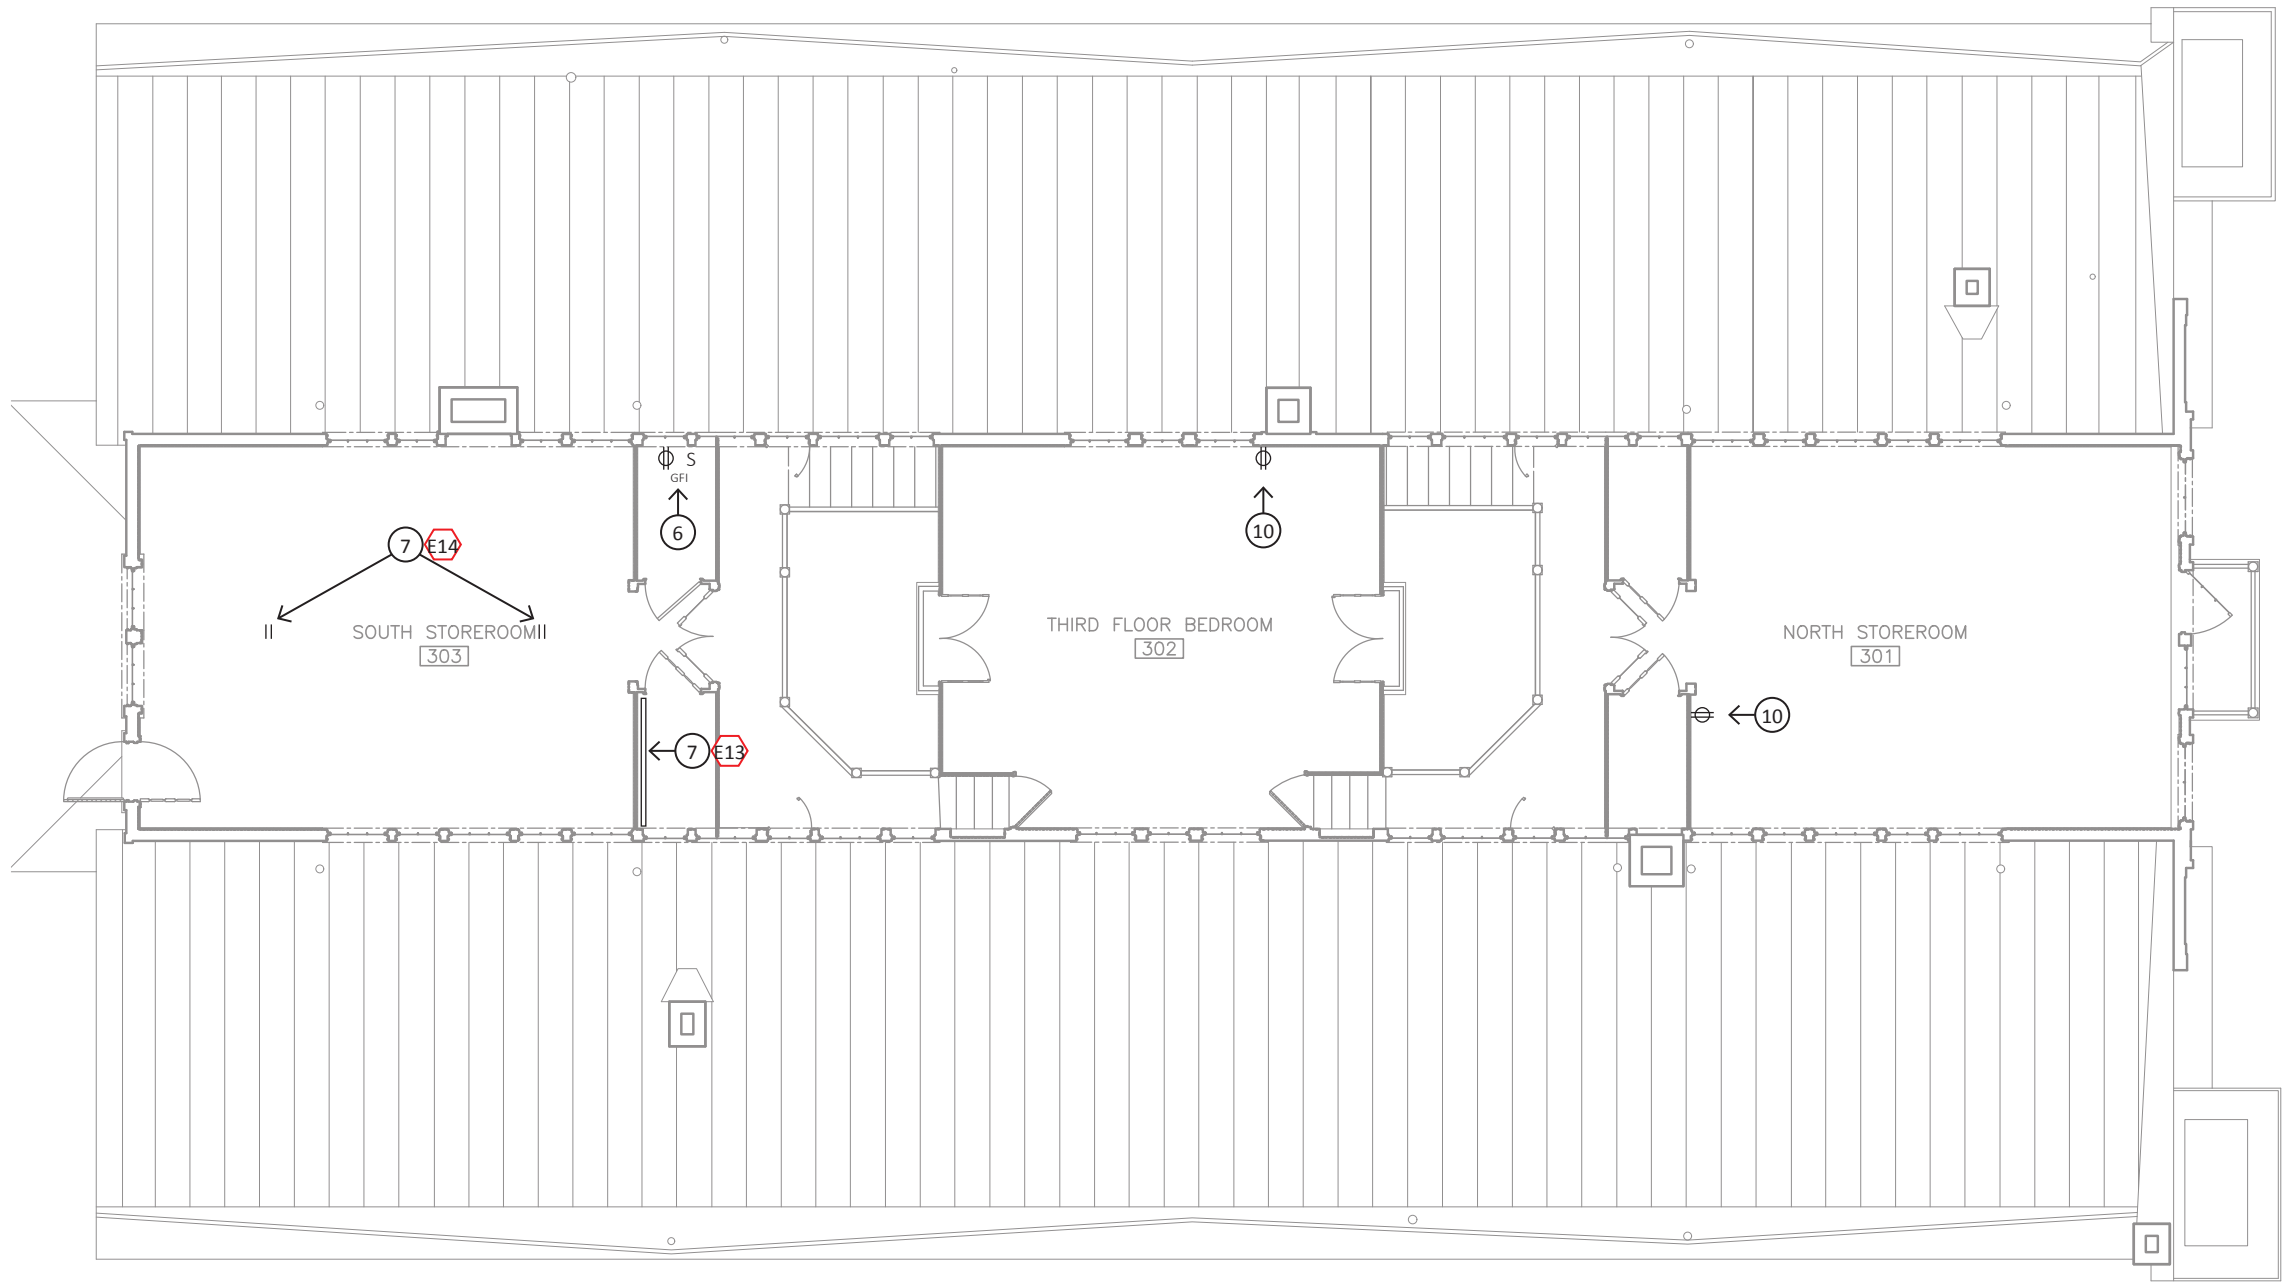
Electrical Existing Conditions Plan - Third Floor
